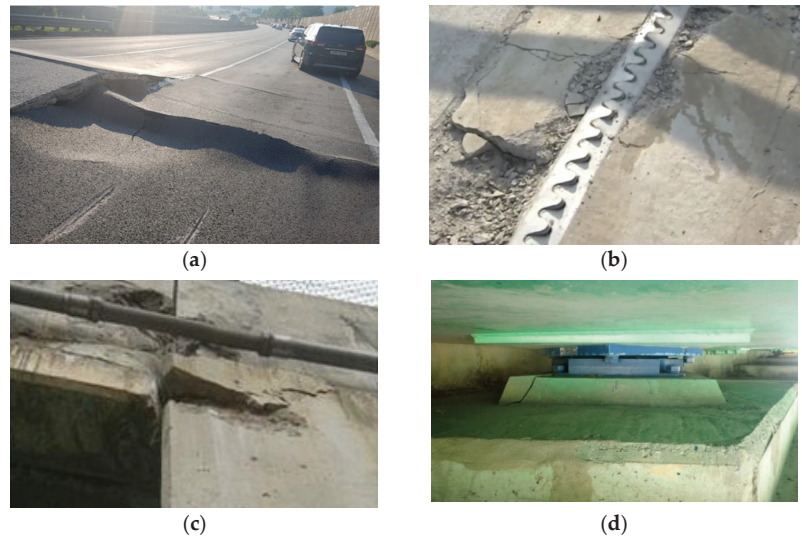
Examples of major damage at road bridge expansion joint: (a) blow-up in road pavement, (b) lack of joint gap in expansion joint, (c) damage to wing wall of bridge abutment, and (d) damage by excessive bridge support movement.
